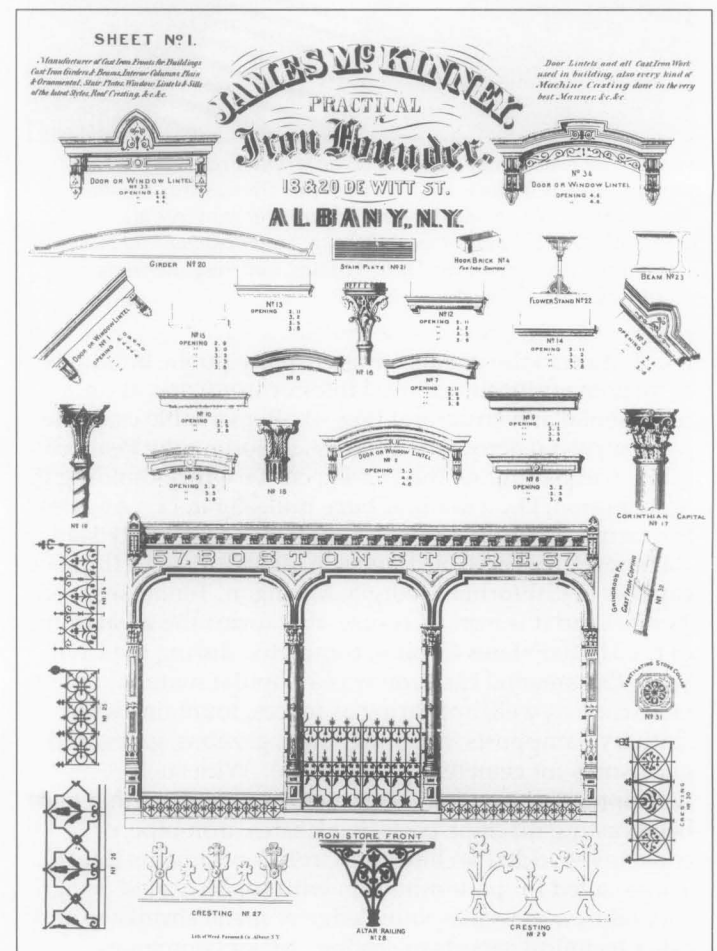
Sheet from a late 19th century manufacturer's trade catalog illustrates some of the products available from foundries, such as storefronts, girders and beams, columns, stairs, window lintels and sills, and roof crestings. Courtesy: Albany Institute of History and Art.
